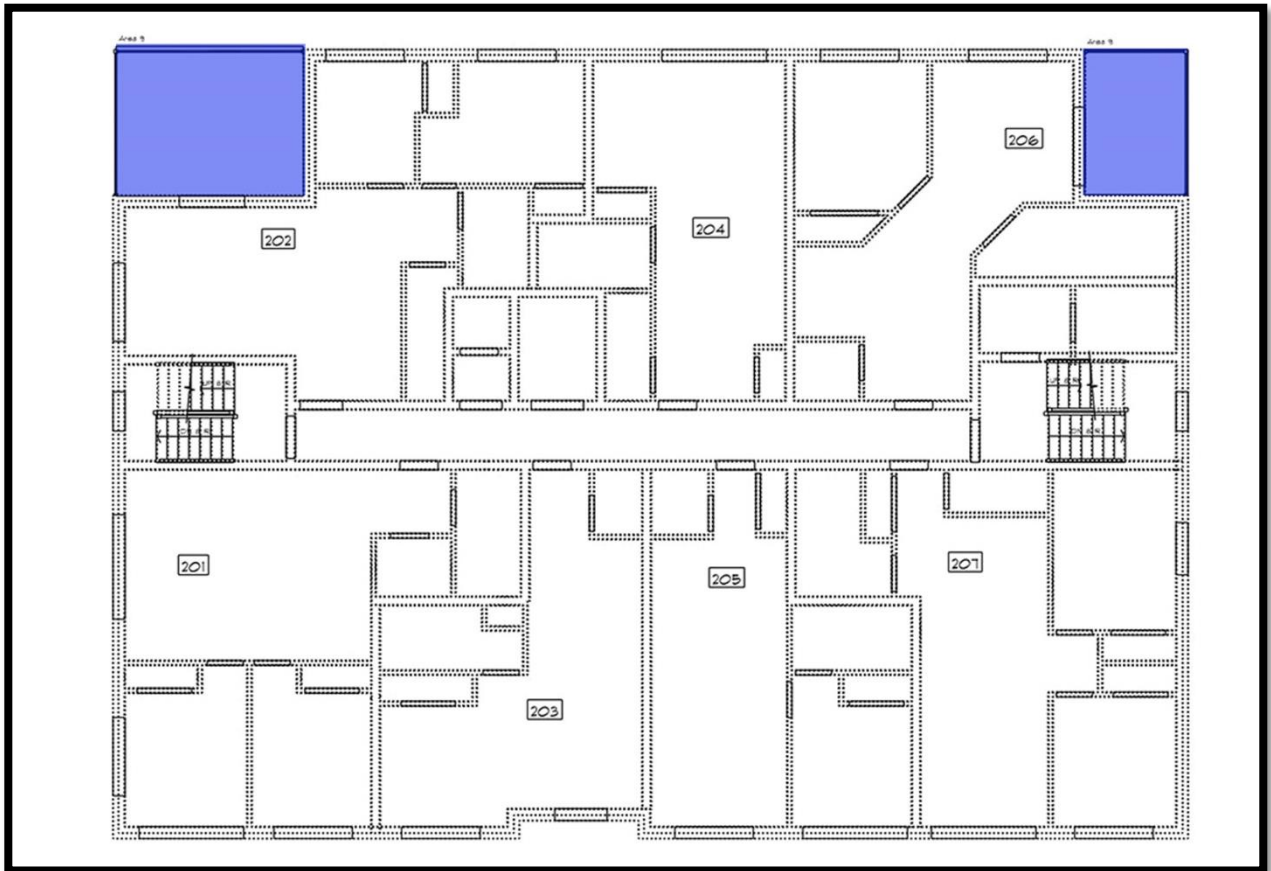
Plan drawing showing Amenity Space in the Second Level
